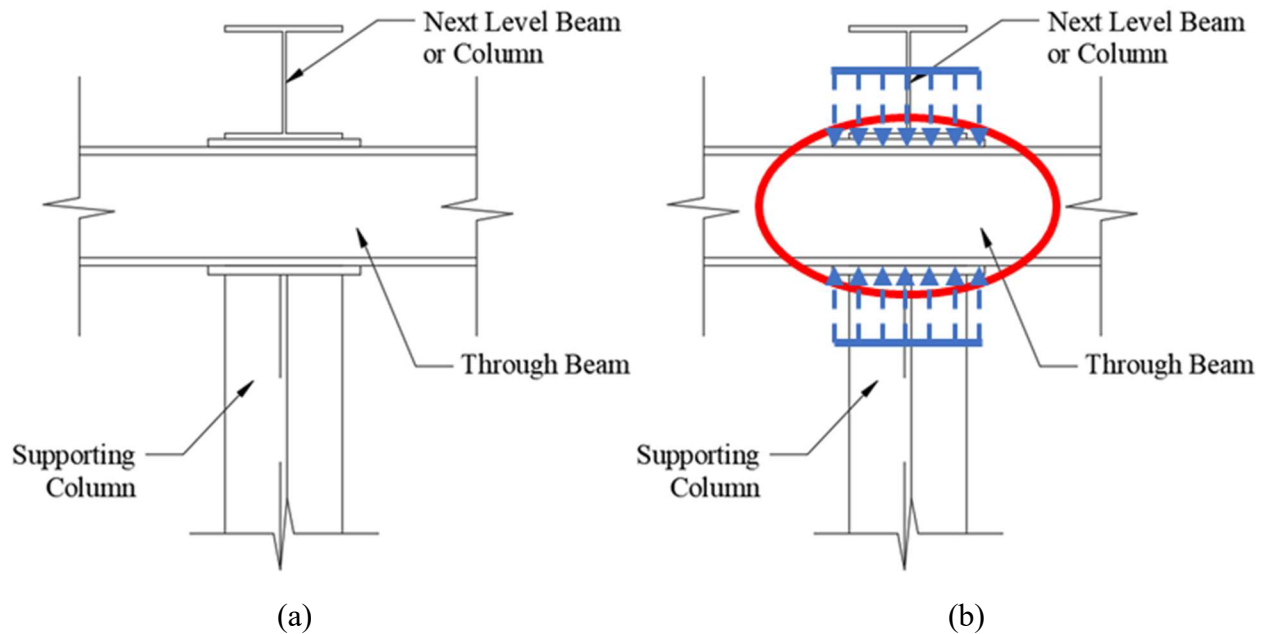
(a) Typical Through Beam Connection Over Supporting Column and (b) Resultant Forces Causing Web Compression Buckling
